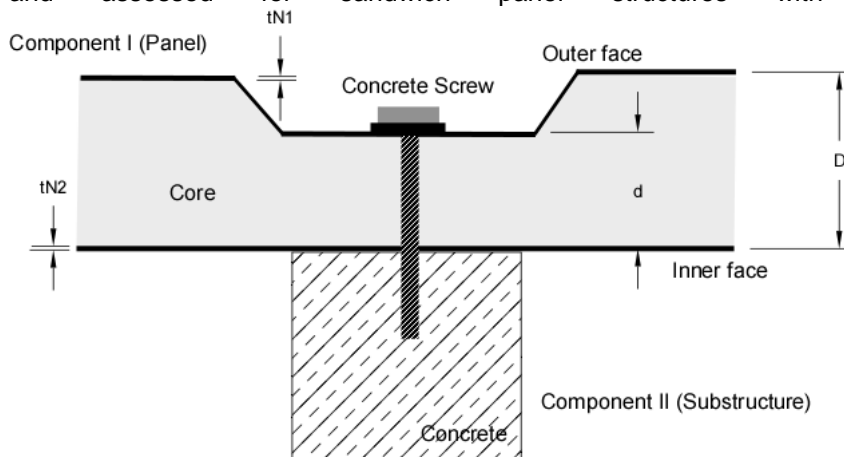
Example of an application of concrete screws used to fix sandwich panels at a substructure made of concrete.
